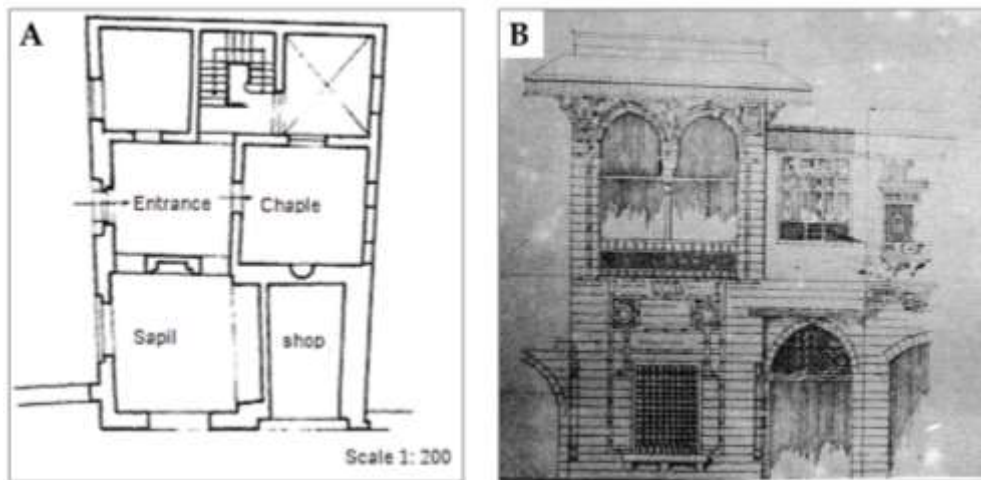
A. Plan of the Mustafa Sinan's Sapil, B. The façade of Mustafa Sinan's Sapil overlooking Soq al-Silah Street, monument 246, and shows the façade of the Kuttab "Archives of the Antiquities Authority" (Al-hussieny, 1988, 404-464)
